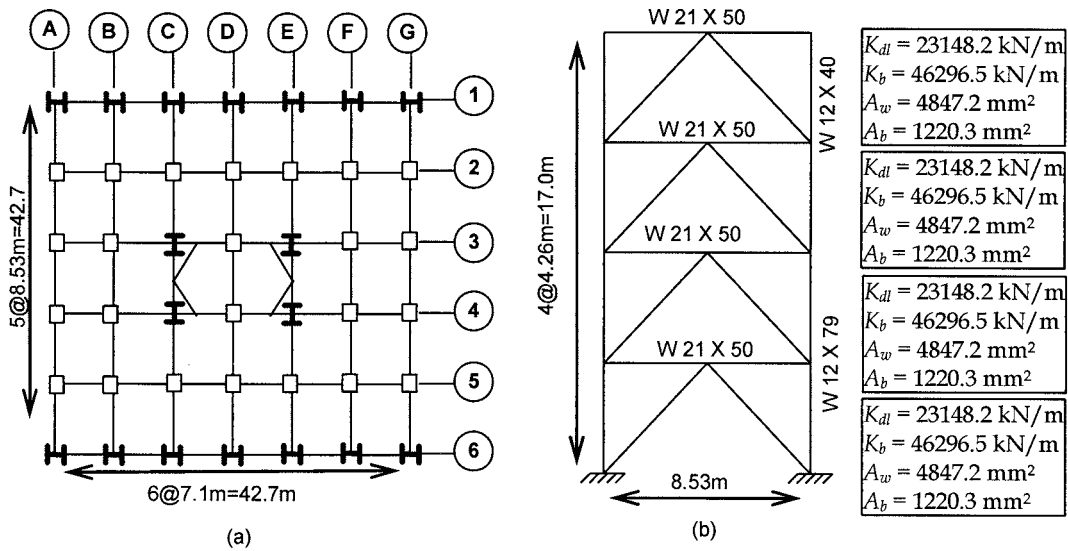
(a) Plan (b) Elevation of 4-Storey office Building
